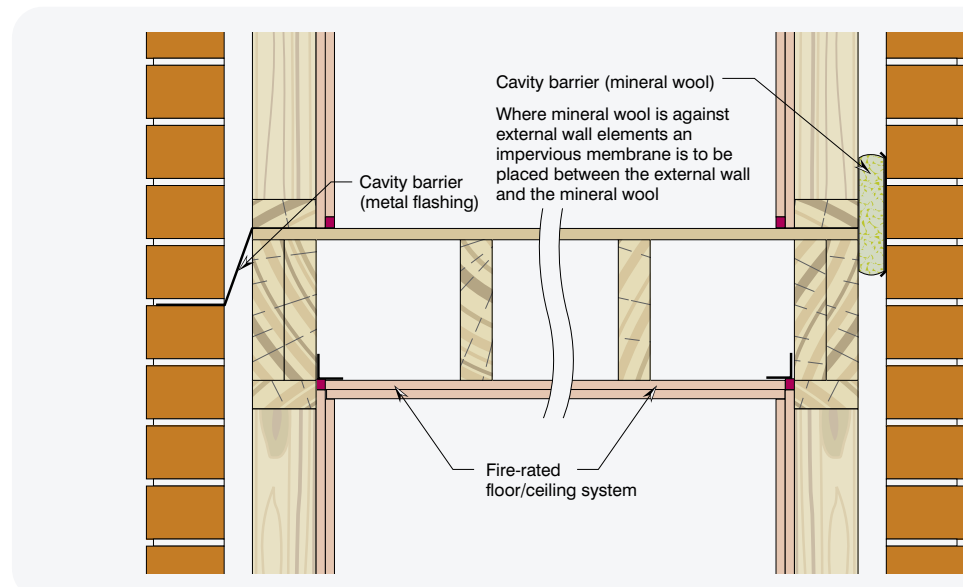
Junction between fire-rated floor and fire-rated external walls – elevation view.
